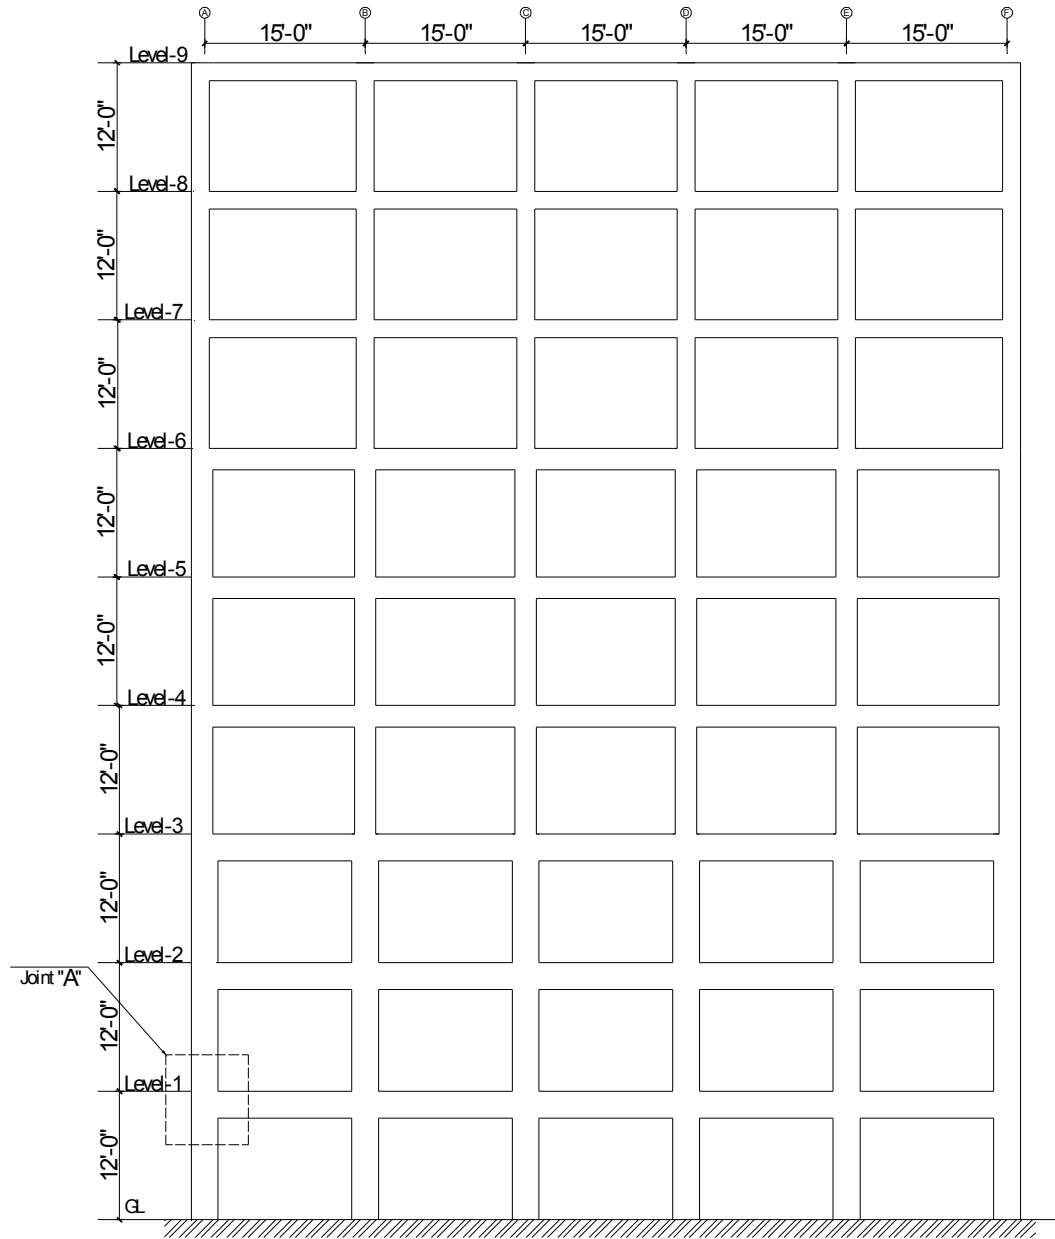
Plan View of Nine-Story RC Building (Tuhin, 2016)
